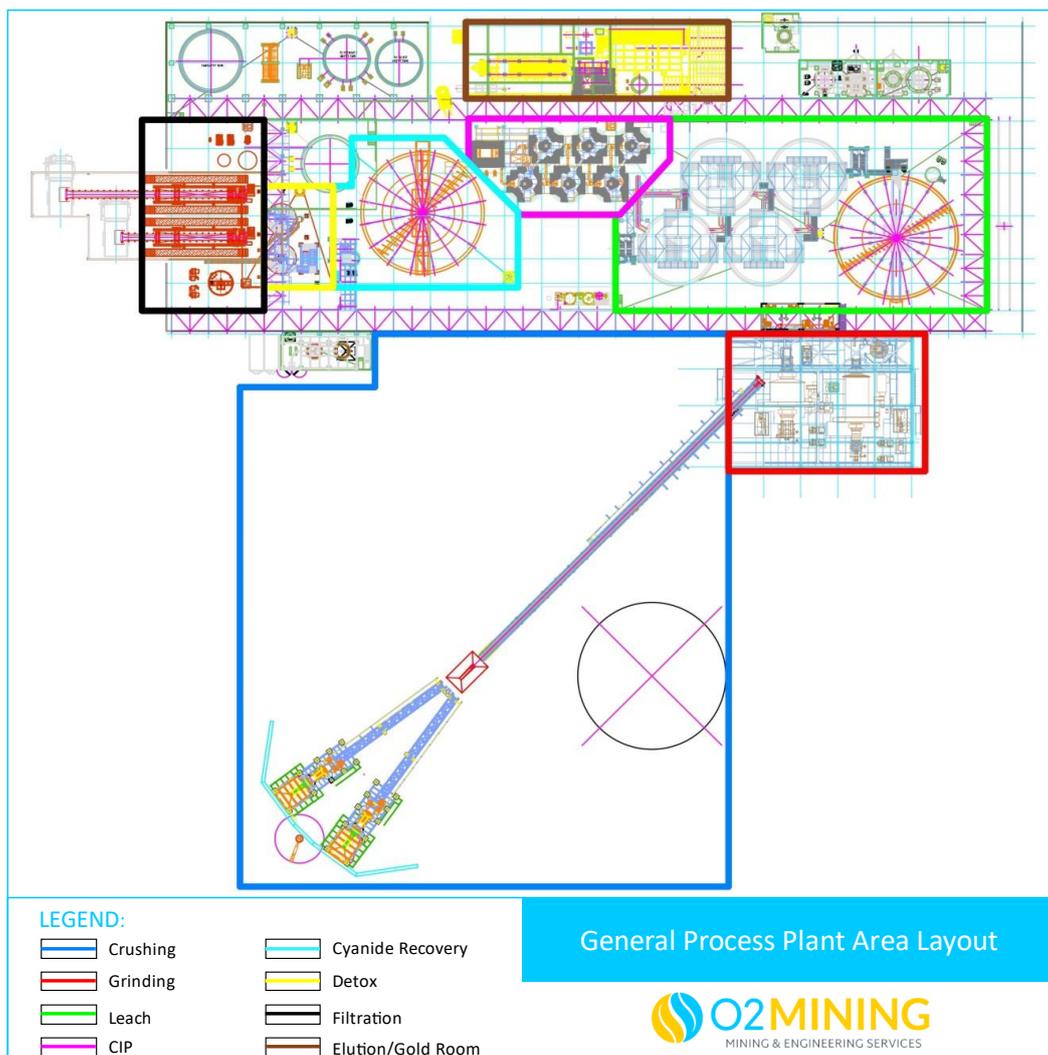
General Process Plant Area Layout (Source O2 2023)
